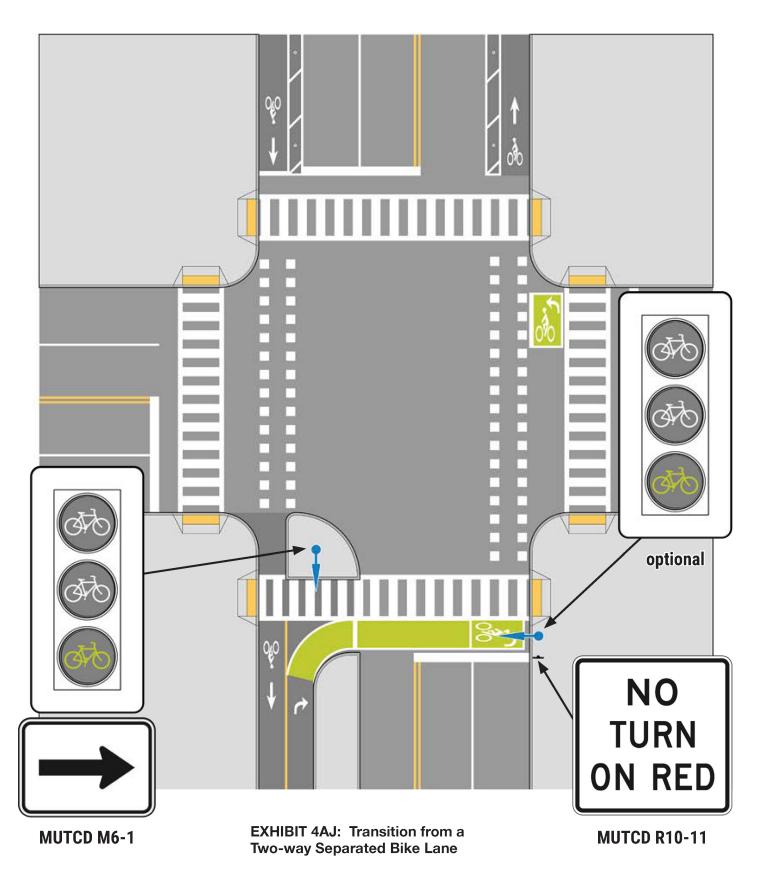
Transition from Two-Way Facility to One-Way Facility (Near Side Transition)
